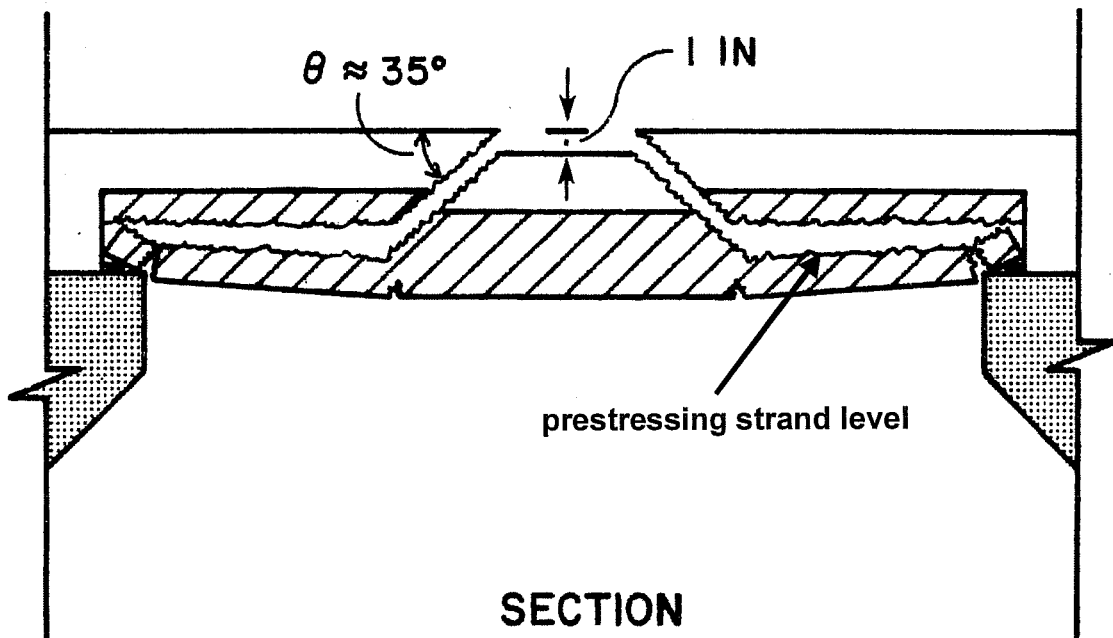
Failure surface of interior slab location (Bieschke & Klingner 1982)
